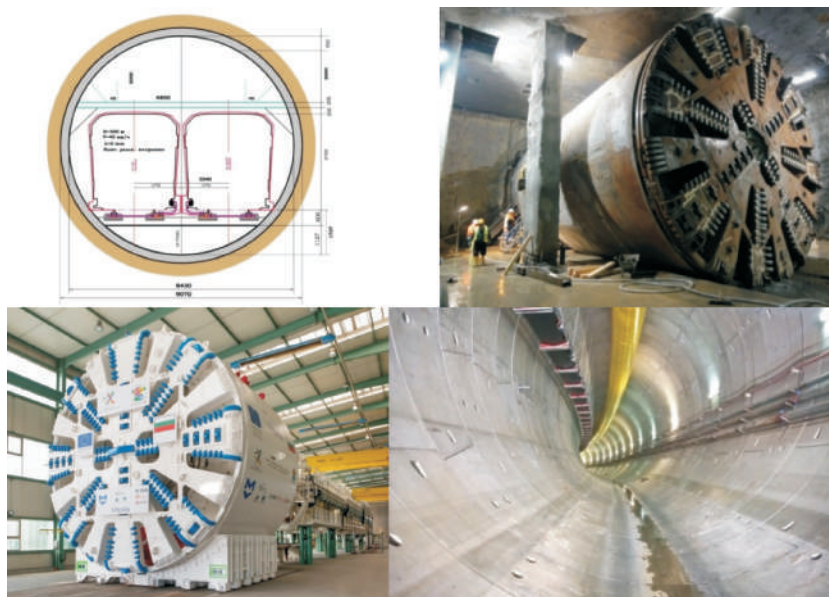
Scheme of the double-road tunnel, TBM and view of the completed tunnel of central part of Line 3
